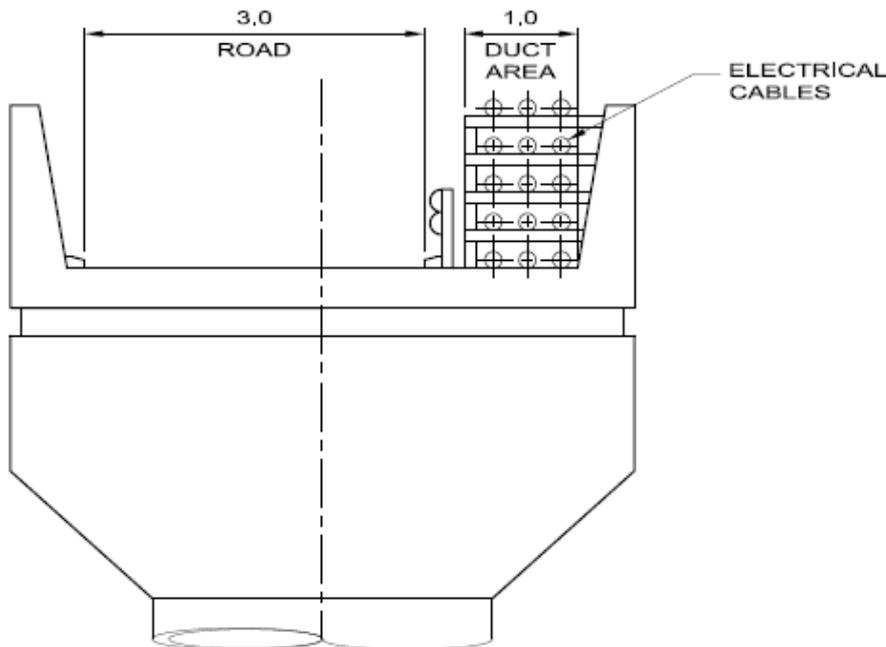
Drawing showing accommodation of electrical cables along the bridge deck.
